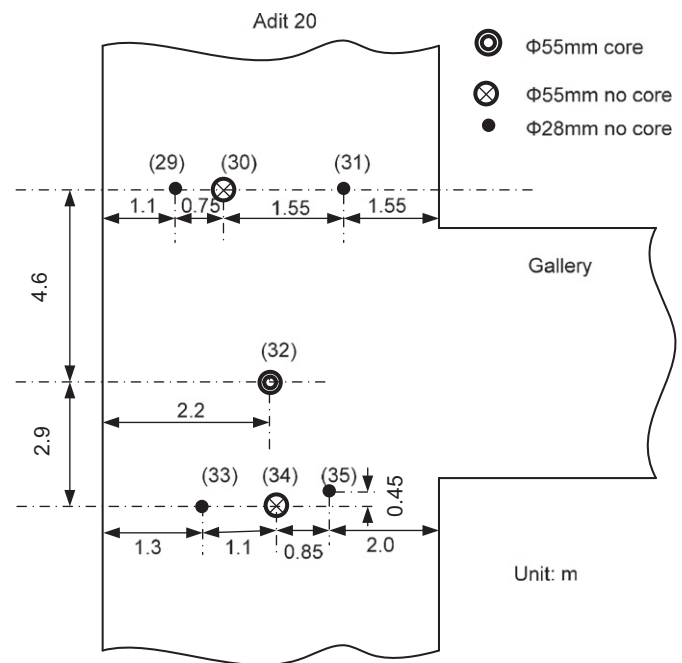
Layout of the drill holes (plan view of Adit 20 roadway).
